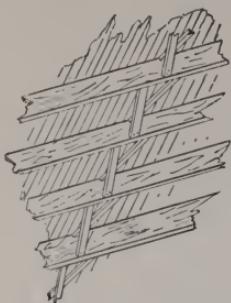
BRIDGING OF FLOORS AND ROOFS.
